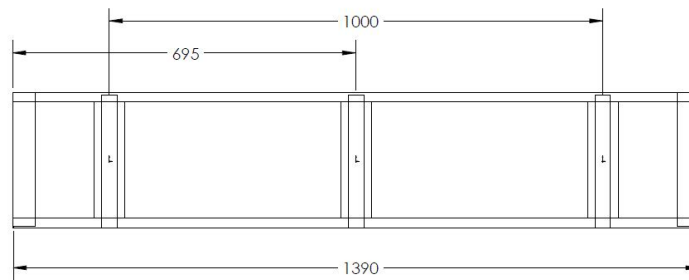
Dimensional details of specimen PS1W1 & PS1W2
